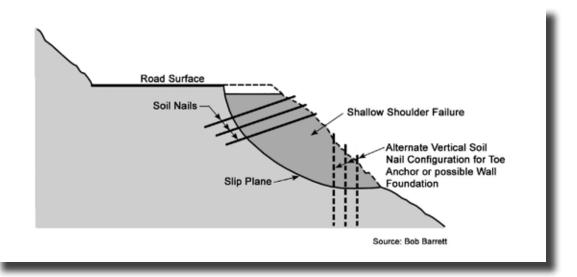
A roadway shoulder failure stabilized with launched soil nails.
